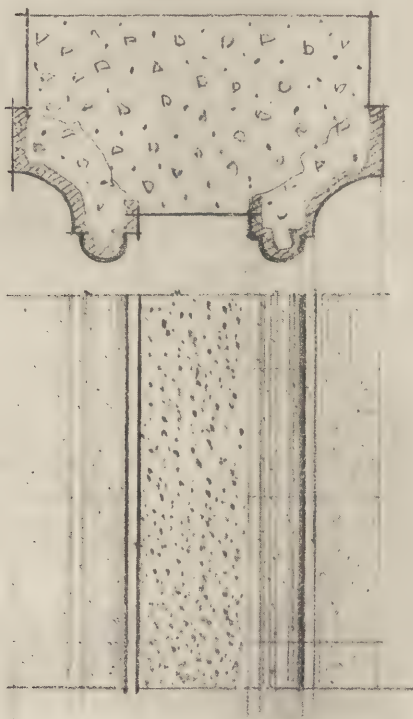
CONCRETE EXTERIOR WALL PIER,
